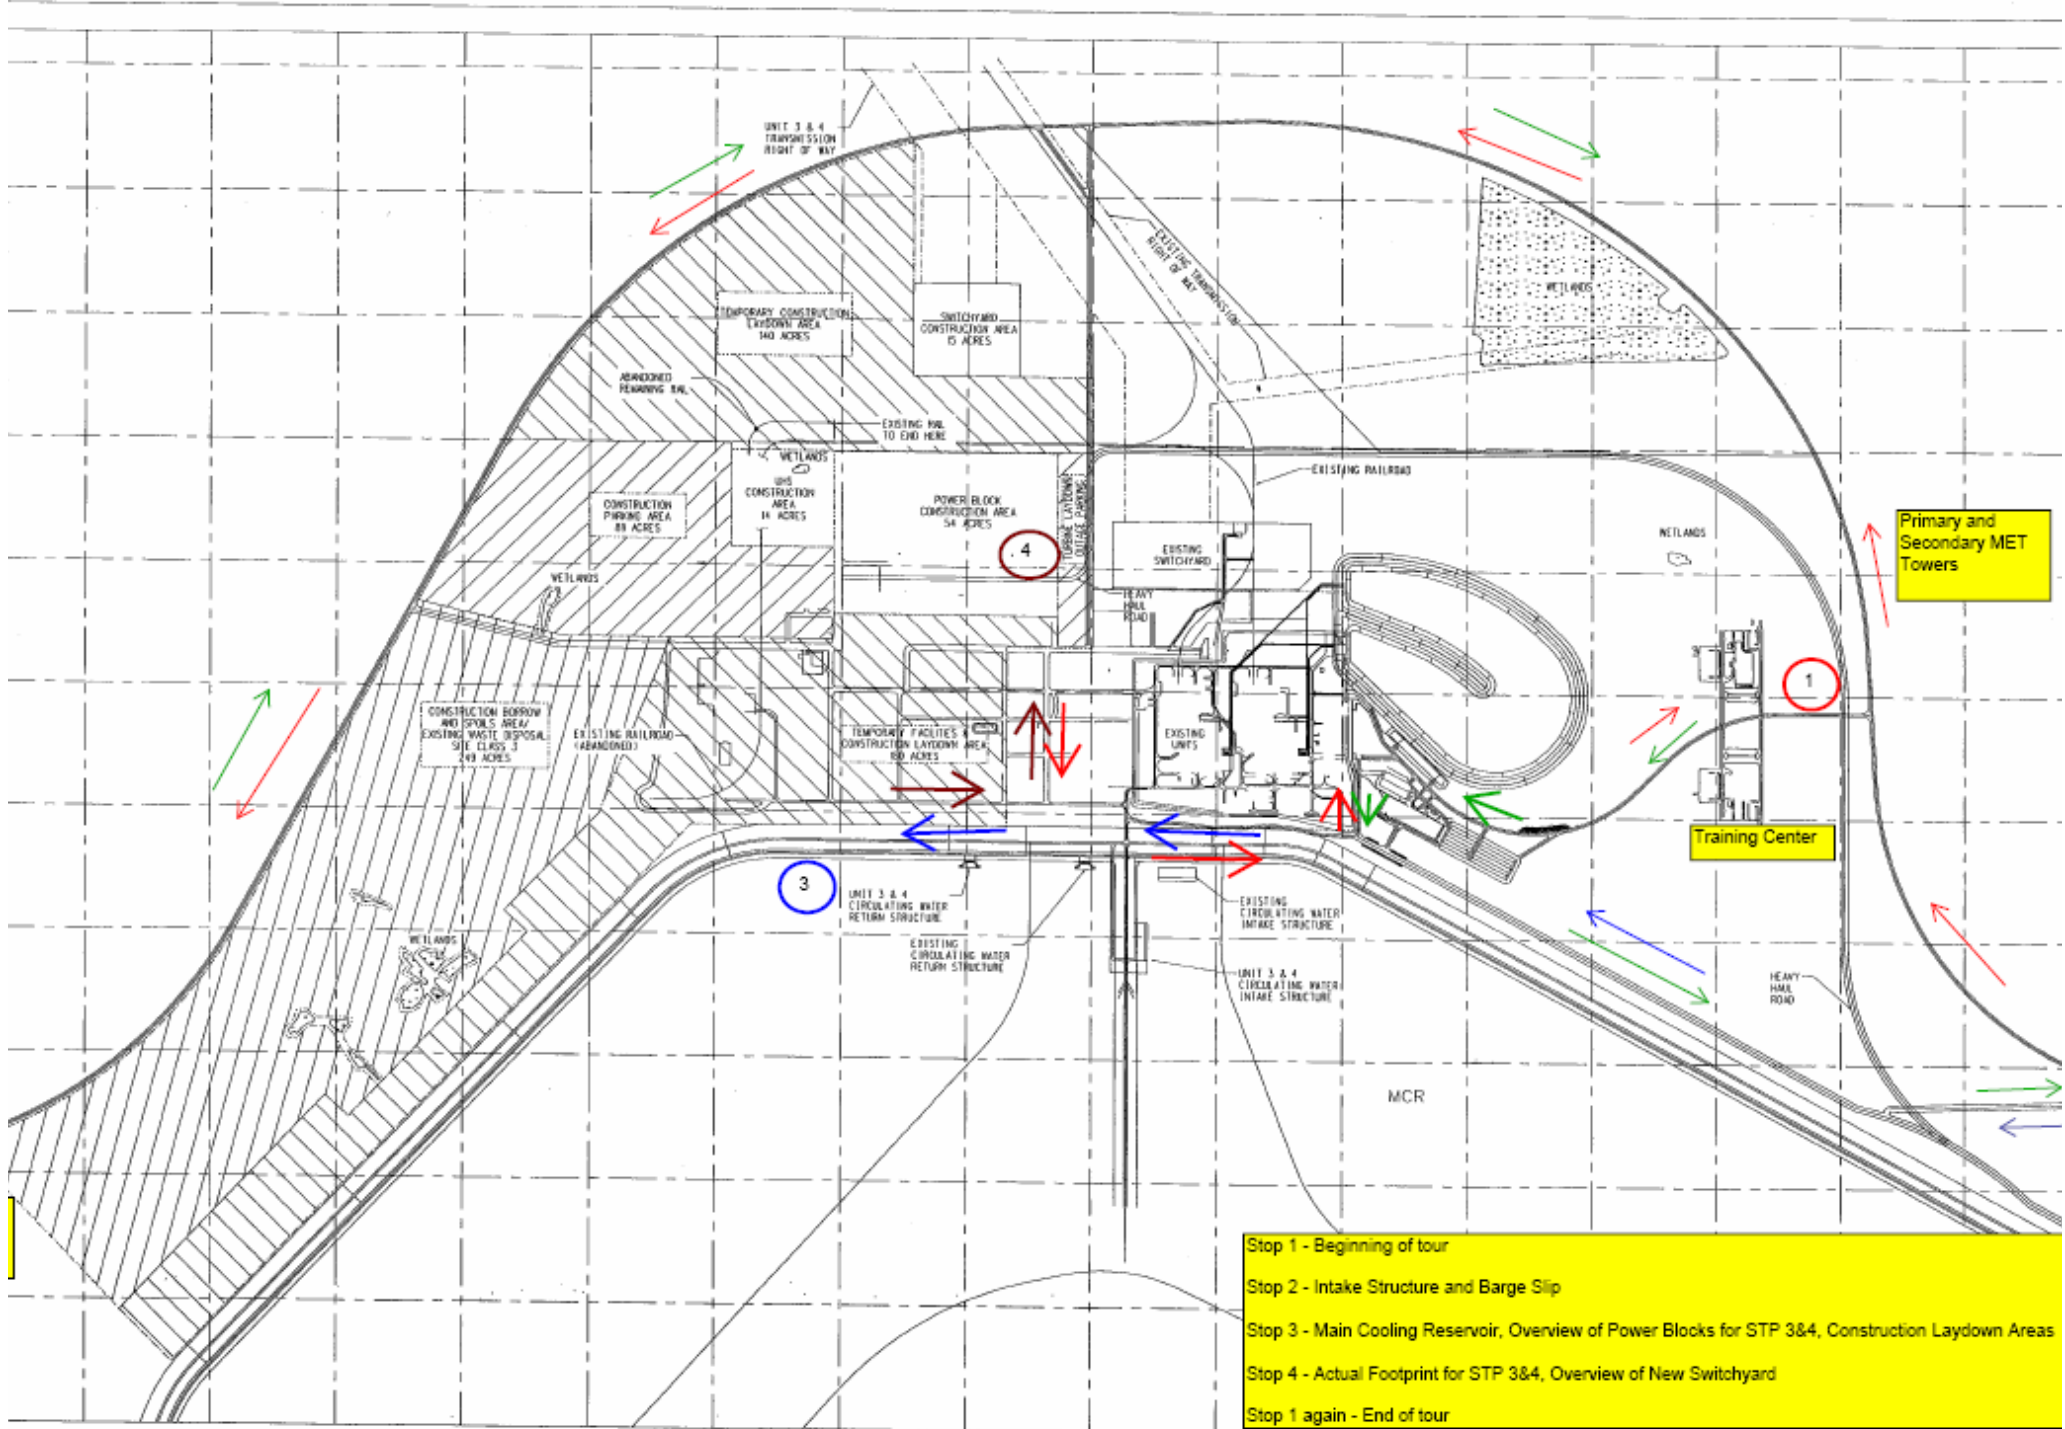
CONSTRUCTION FACILITIES PLAN
